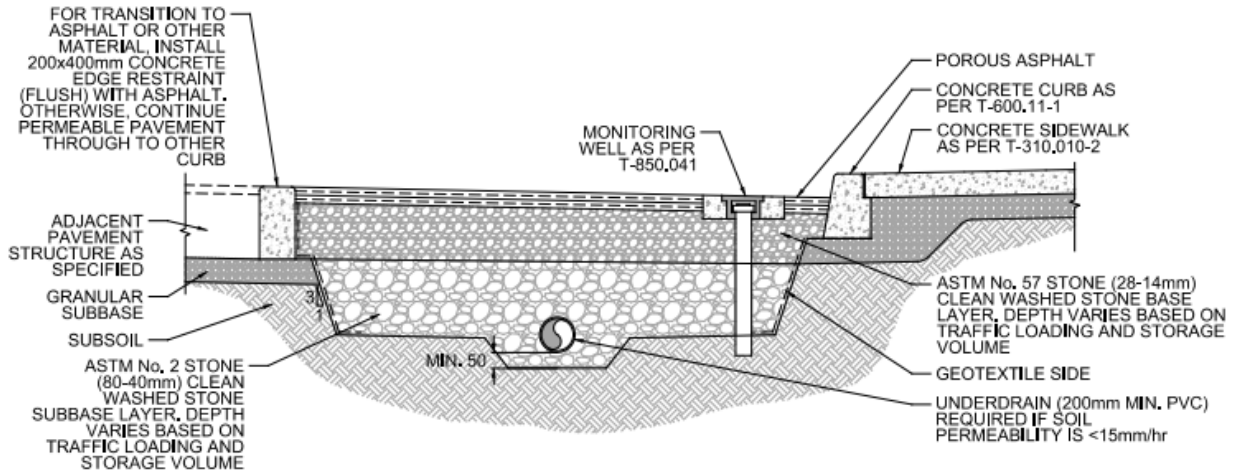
Material Sequencing in Typical Cross Section of Porous Asphalt Pavement
